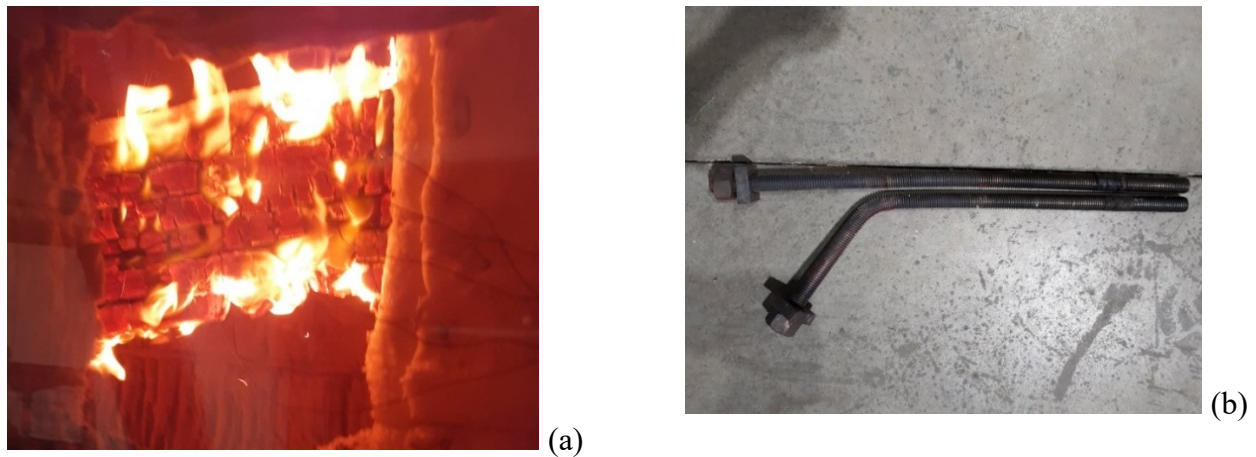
Test-BCF 250-1.5-A after failure: (a) Connection just after failure; (b) Steel rods after failure.
